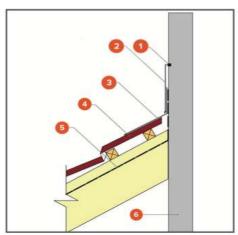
The adjoining of roof pitch to the wall sideways on the slope
